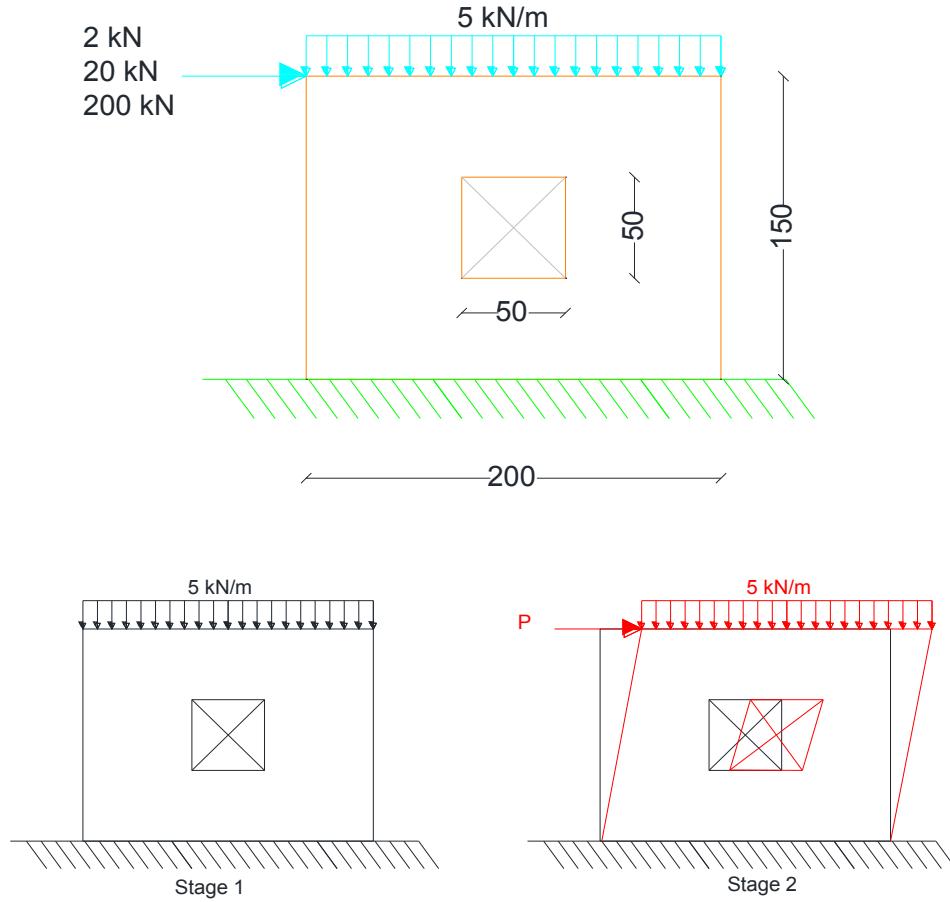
The dimensions and applied loads of the masonry wall model.
